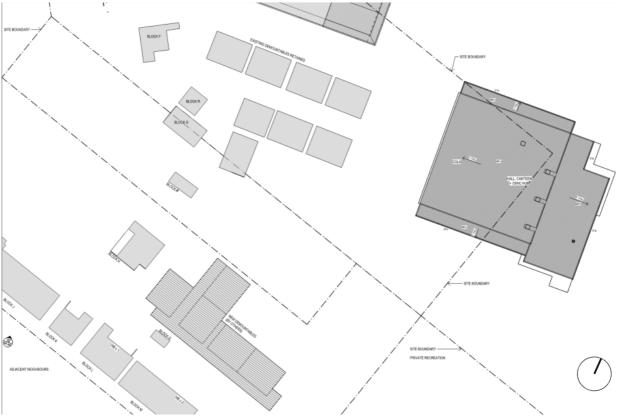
Proposed roof plan – eastern (Source: Pedavoli Architects)
